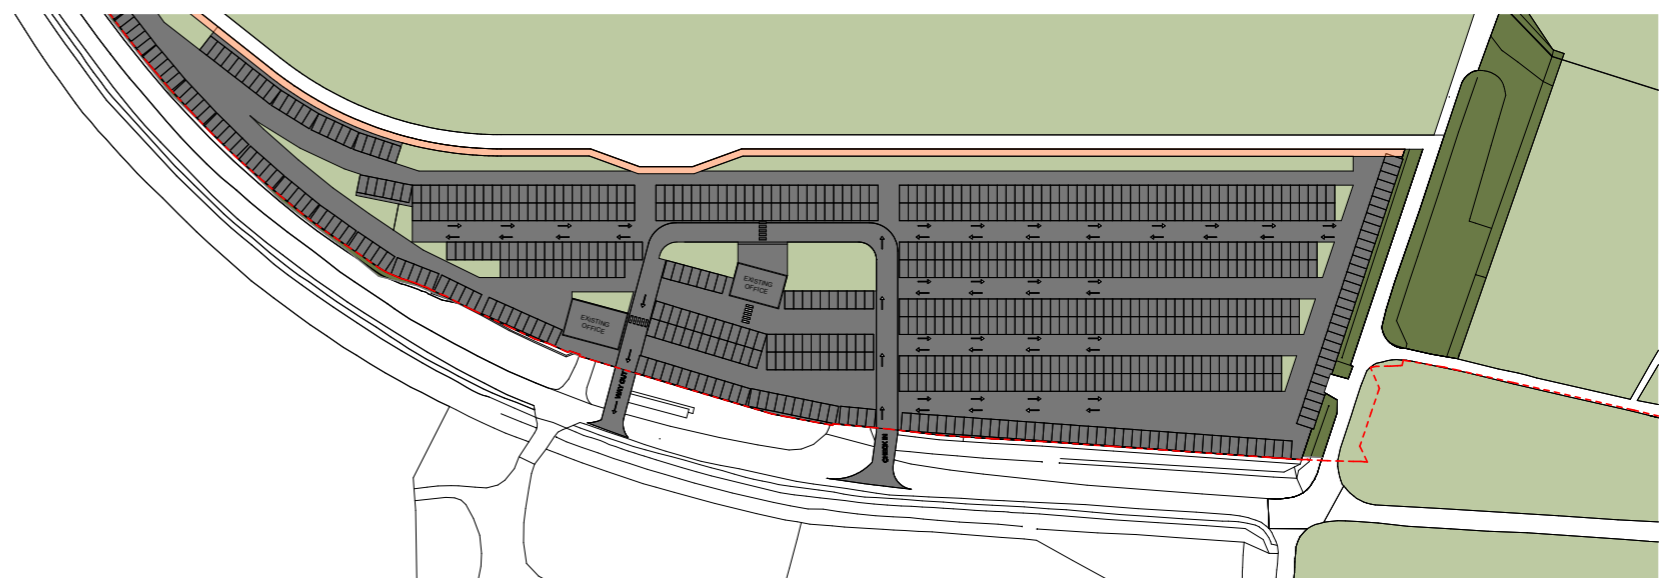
Purple Parking Re-Configuration Indicative Site Plan
